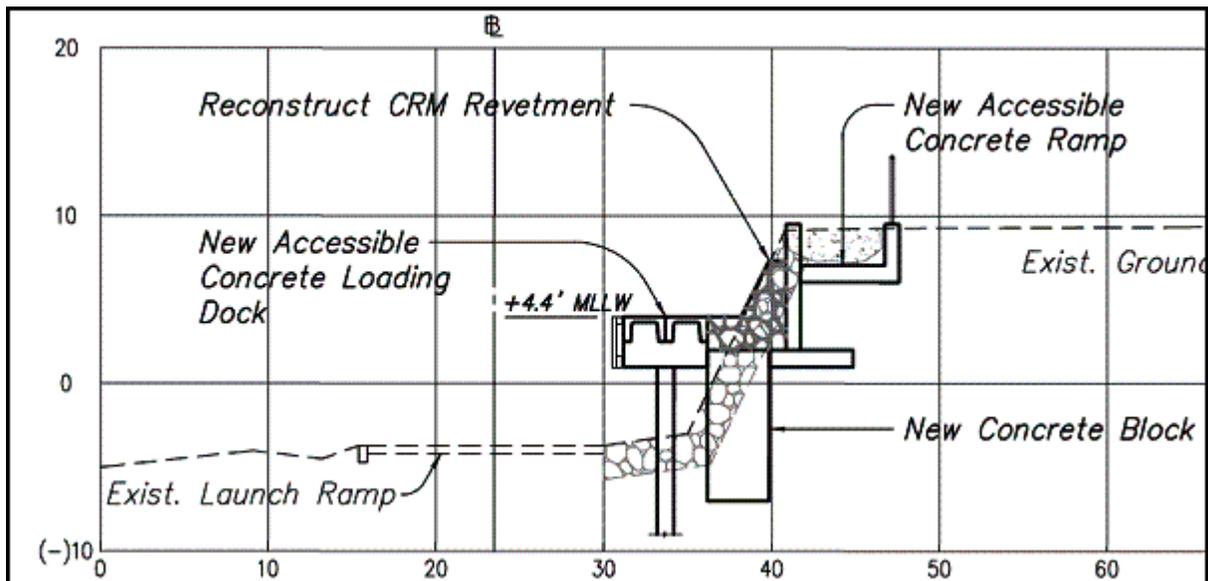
Cross-Section of New Loading Dock and ADA Ramp
